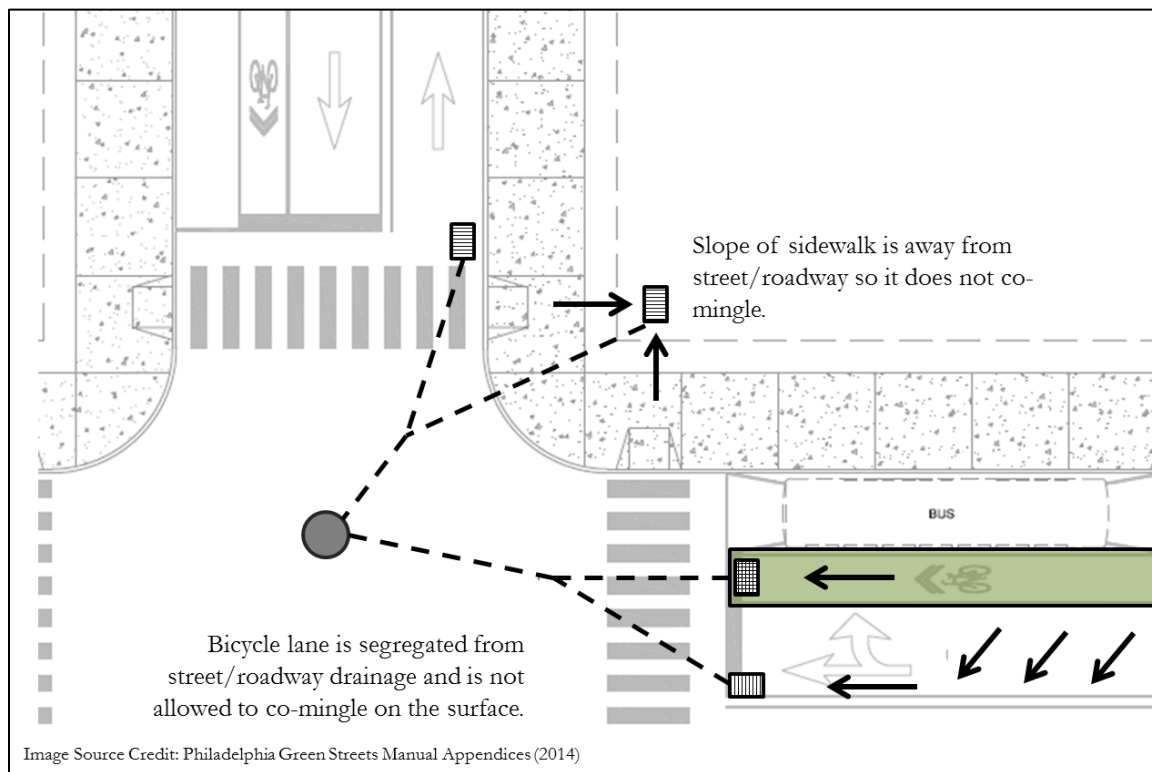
Schematic showing hydraulic disconnection of sidewalks and bicycle lanes in a typical intersection.
